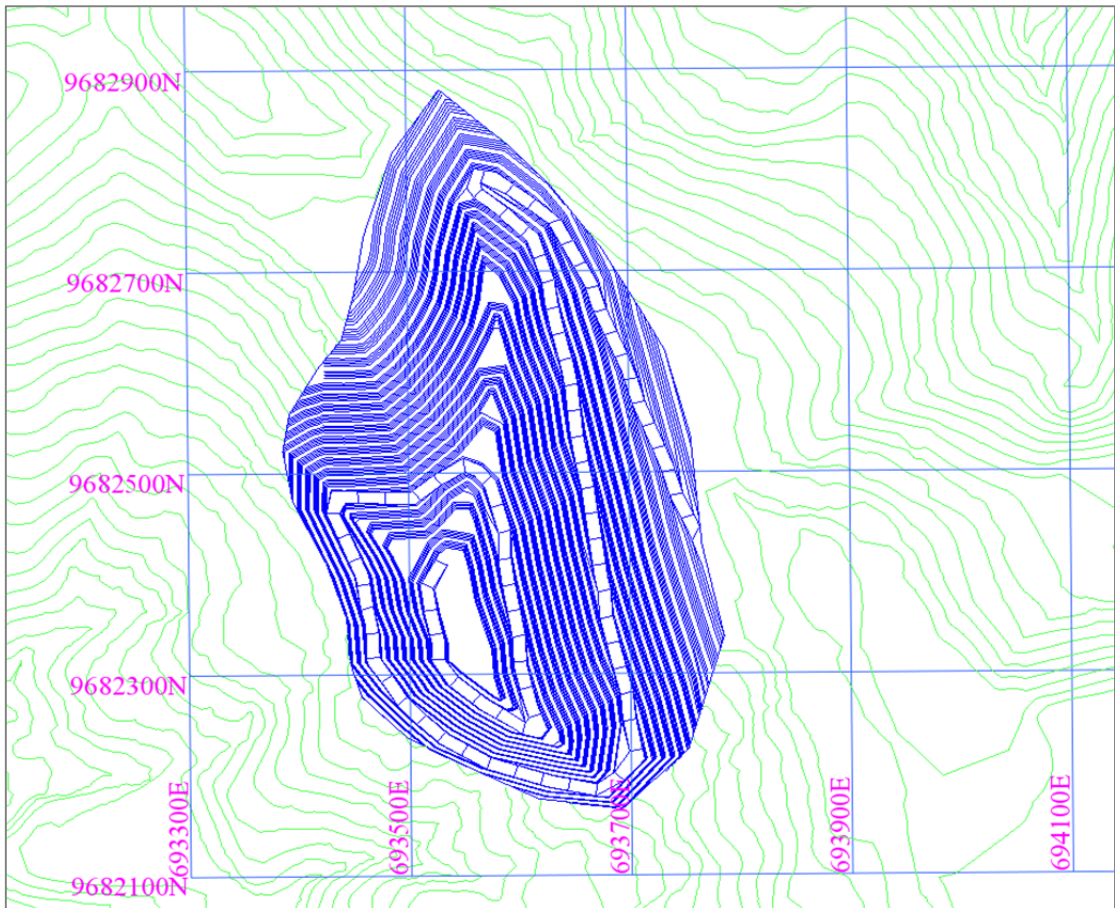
Twangiza Main Intermediate Pit (Cut 1) – Plan View
